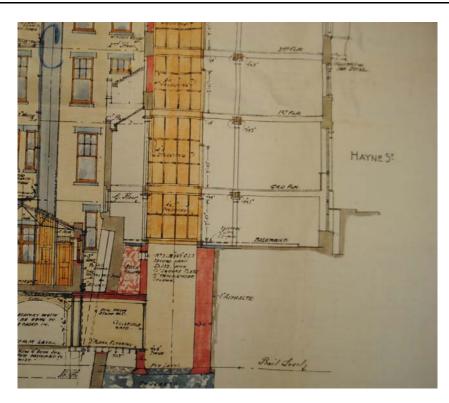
1916 plan showing lift shaft below 8-9 Hayne Street linking the structure to the basement of 3 Lindsey Street (Source - LMA, GLC/AR/BR/22/BA/043620)
